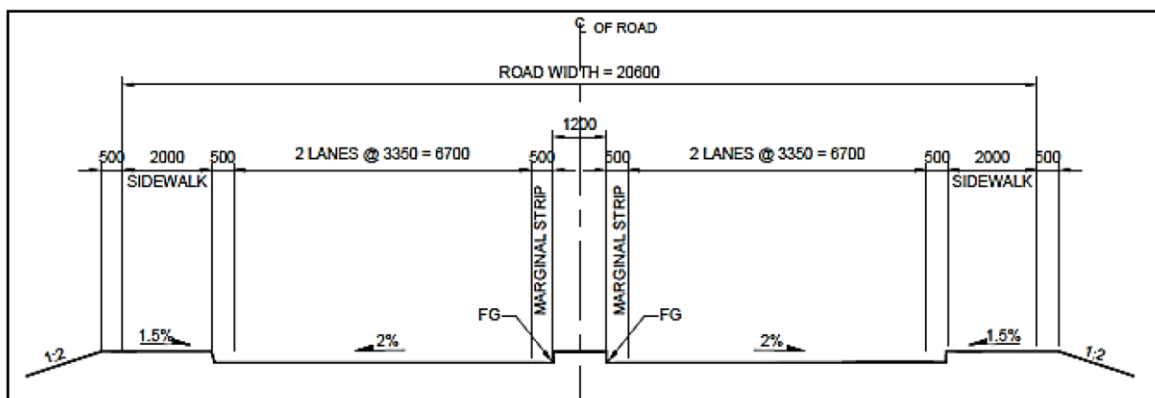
Typical Cross Section of San Pedro/Binan MSR Connecting Road
